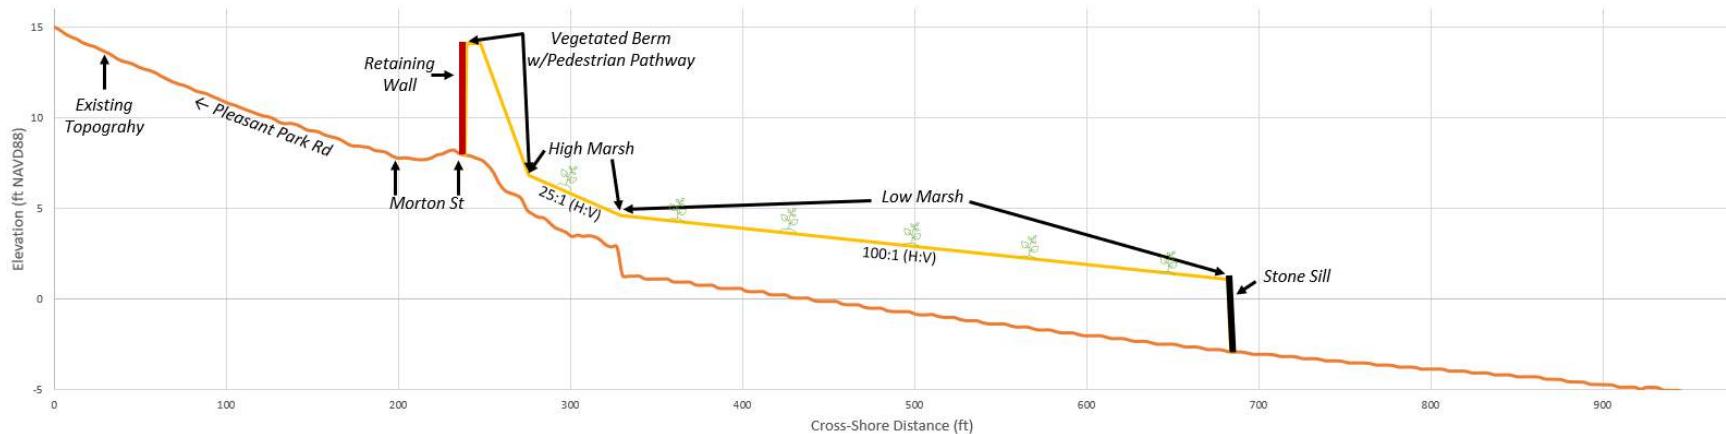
Morton St – Living Levee and Raised Pathway Conceptual Cross-Section (XS-1).
